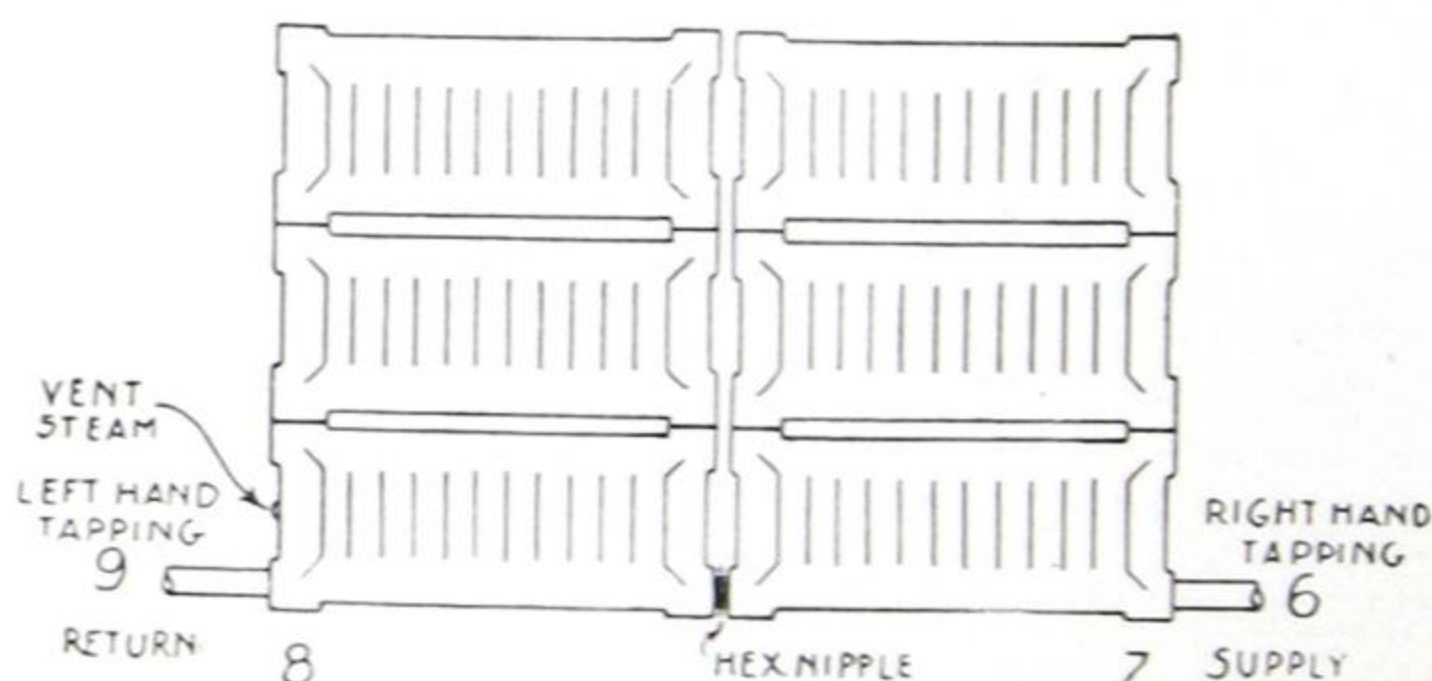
Assembled Six Sections in Three Tiers—One- and Two-Pipe Steam
